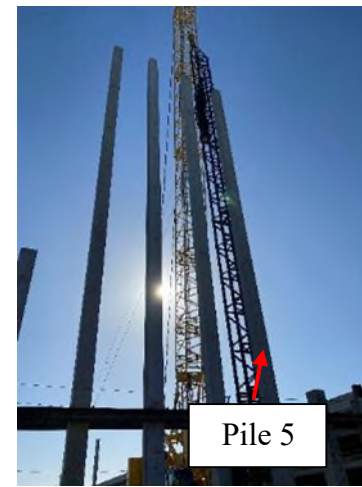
Detailed view of Bent 4 foundation layout at Site C.
